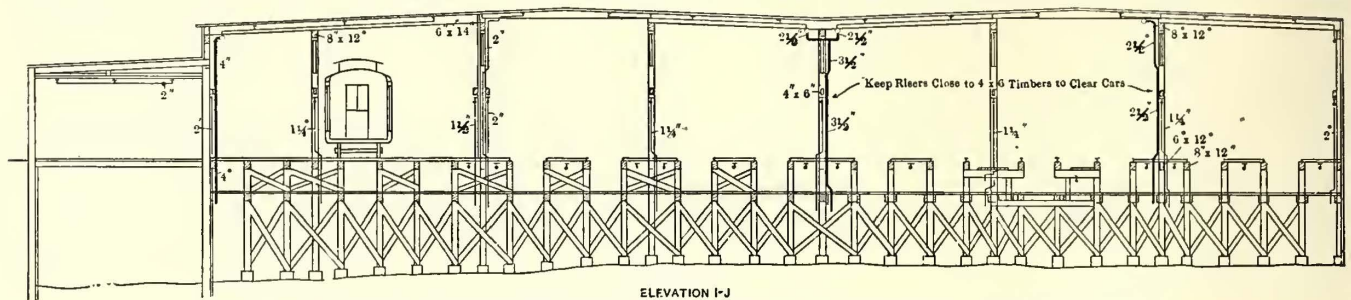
Fire Protection of Milton Car House.—Elevation, Showing Aisle Sprinklers
